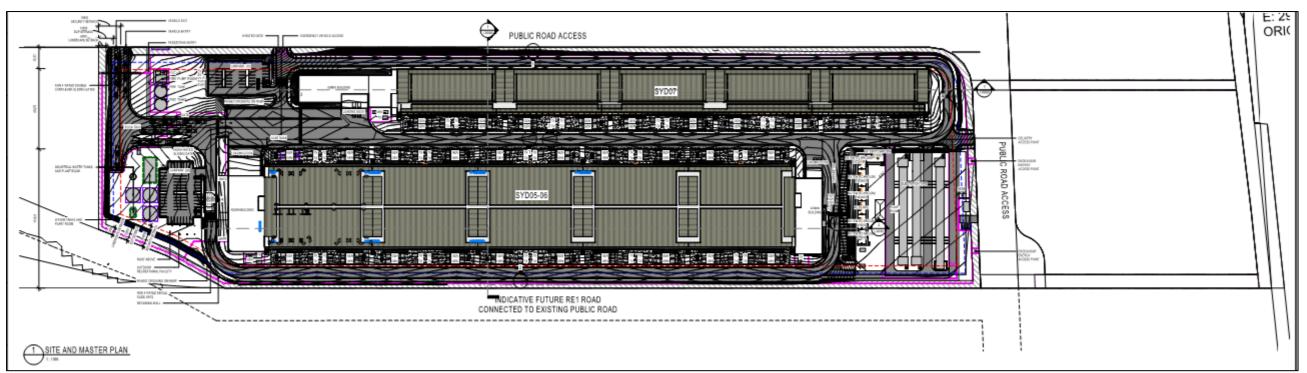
Proposed Site Plan – Proposed Data Centre (Source: Greenbox Architecture, 2021)
